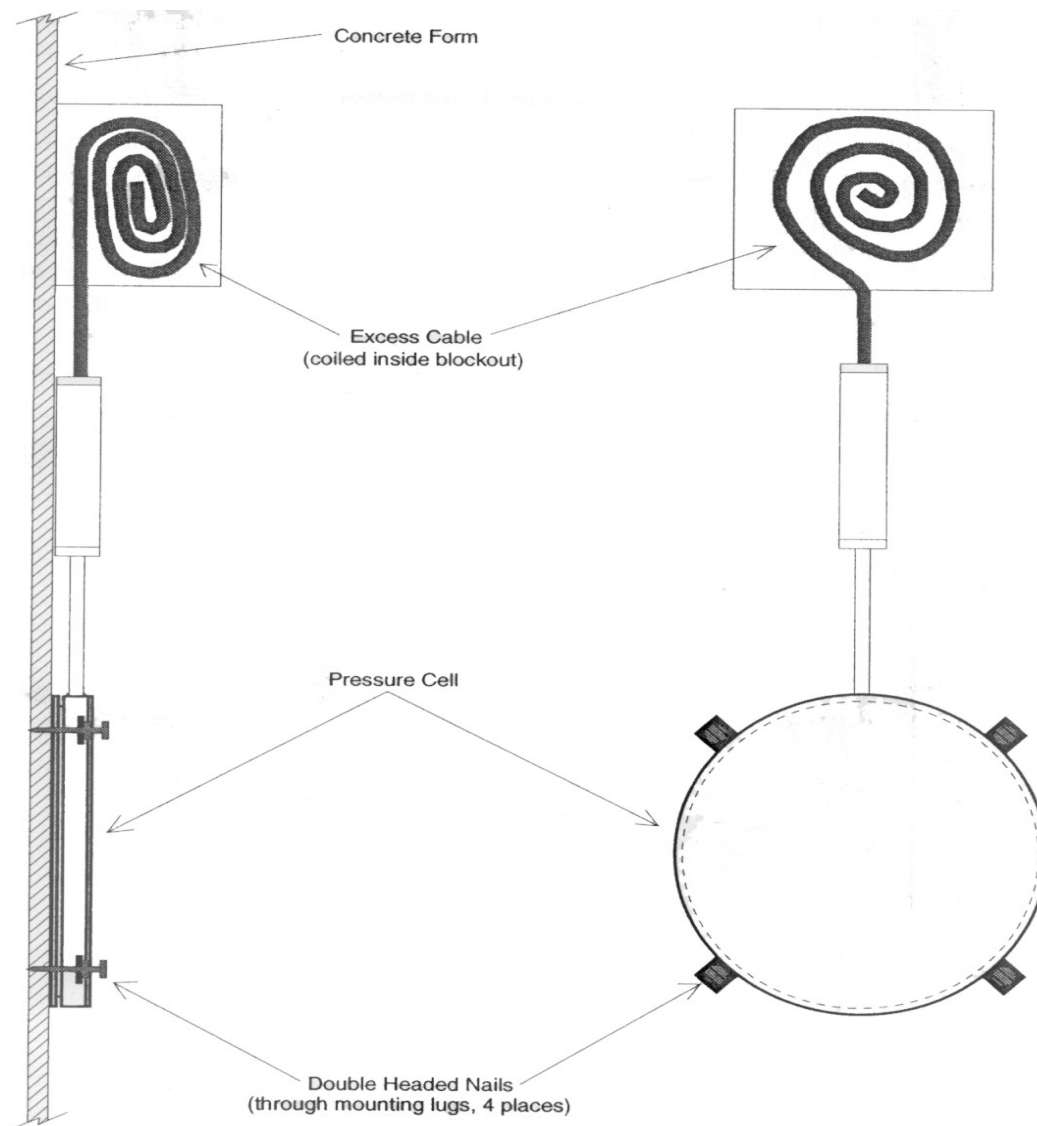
Attachment of Model 4810 to Concrete Form
